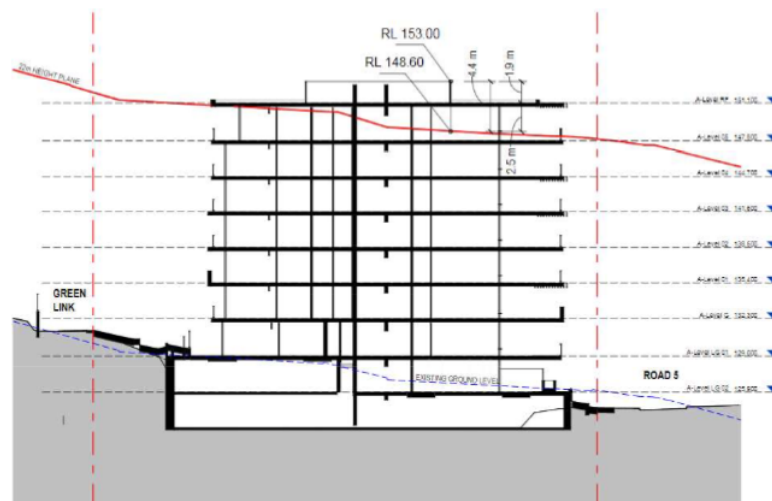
South Section of Building A showing the extent of height contravention (4.4m) (Source: Mirvac Design)
